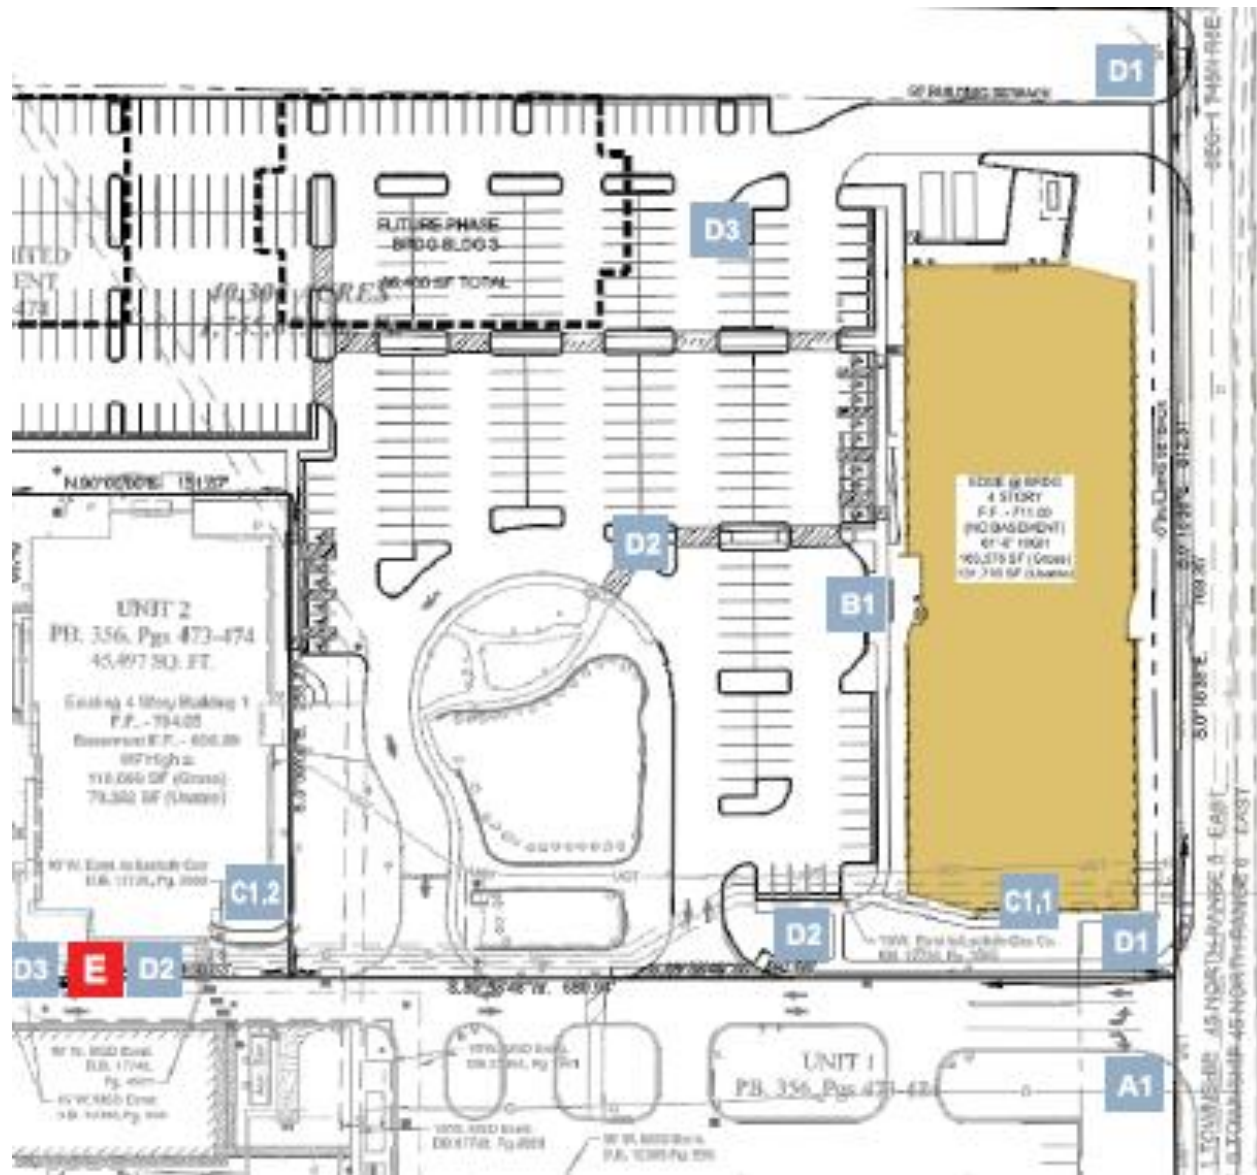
Close-up of the Site Plan showing the new signage proposed for the BRDG Park, the Edge building under construction for Benson Hill, and a future development
